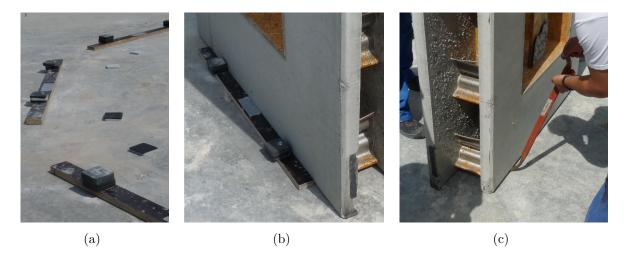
Double wall positioning process with (a) wooden alignment boards and plastic distance plates providing a certain height level, (b) an aligned double wall and (c) the fine adjustment of an element with a crowbar
